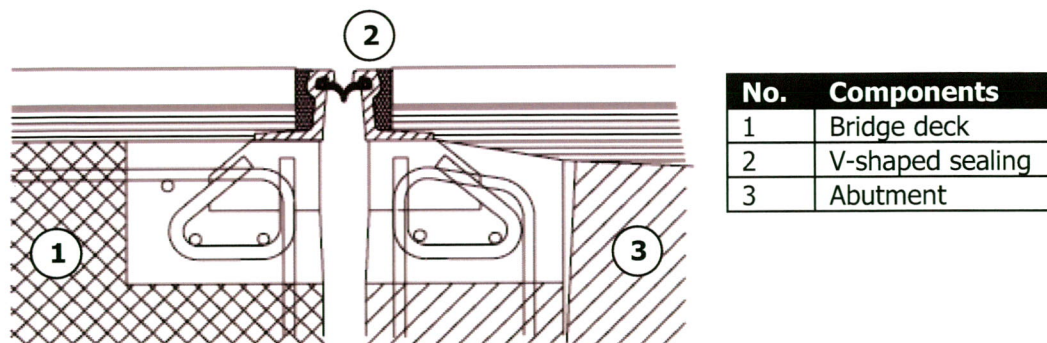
Nosing joint with V-shaped sealing connected to a concrete deck system.
